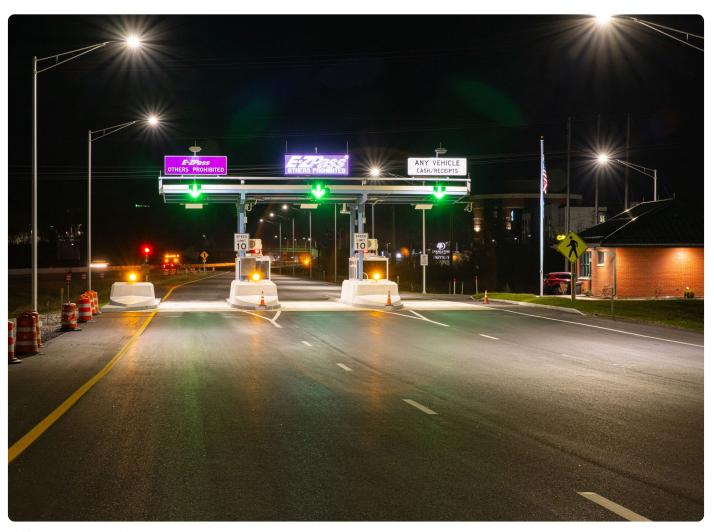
Exit 45 Toll Plaza Northbound On-Ramp
